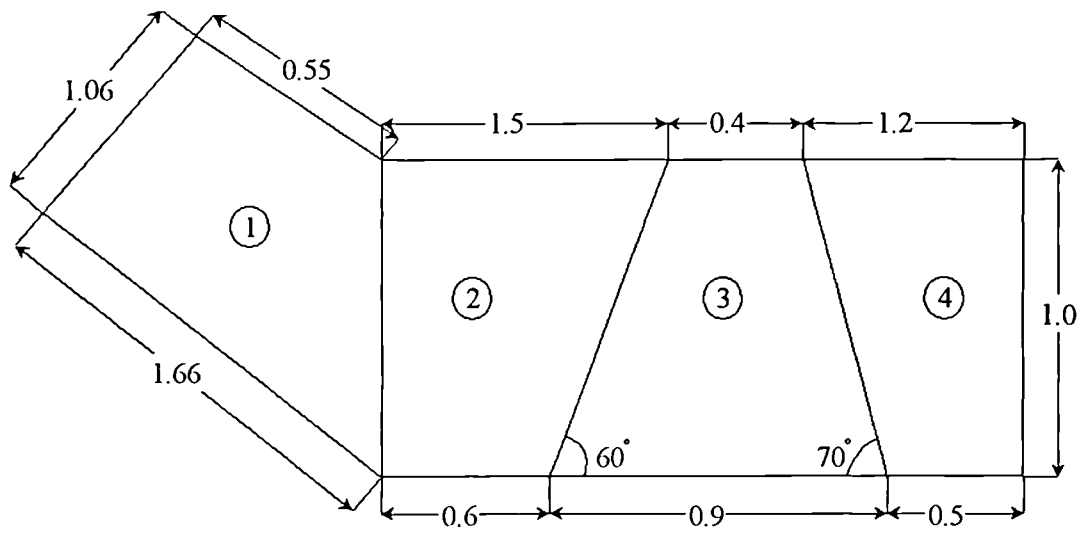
Plan view of simply-supported irregular plate assembly.
